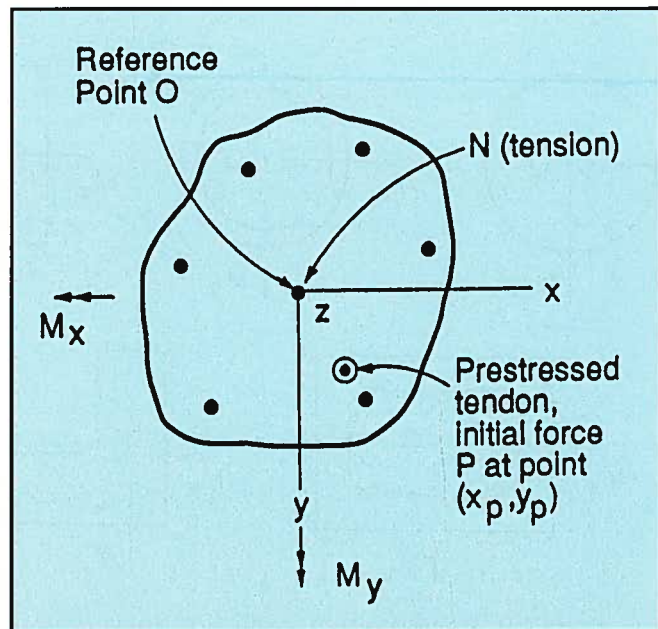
General cross section shape of reinforced concrete member. Positive sign convention.
